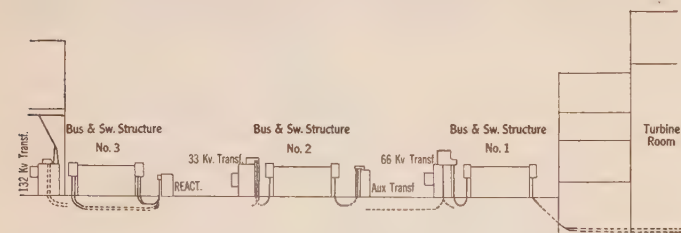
SECTIONAL ELEVATION—22-KV. SWITCHYARD—STATE LINE STATION
